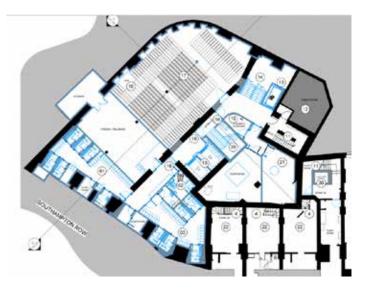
Proposed Basement Layout. Hale Brown Architects
